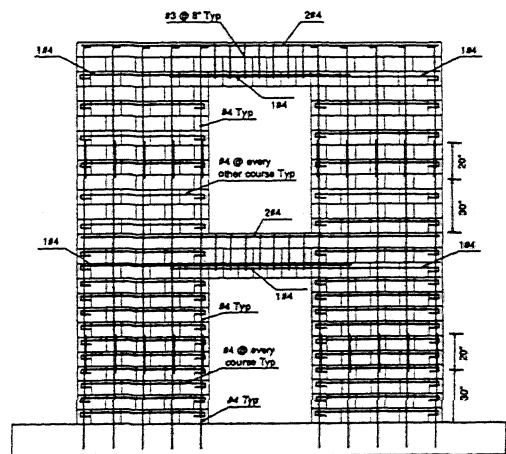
Typical reinforcement for Type 2 coupled wall specimens
